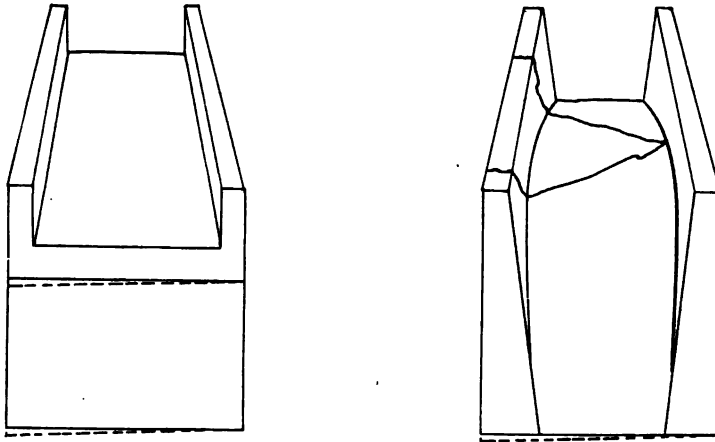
DIAGRAM SHOWING EFFECT OF UNEQUAL SETTLEMENT OF FOUNDATION ON A GIRDER AND AN ARCH BRIDGE.
